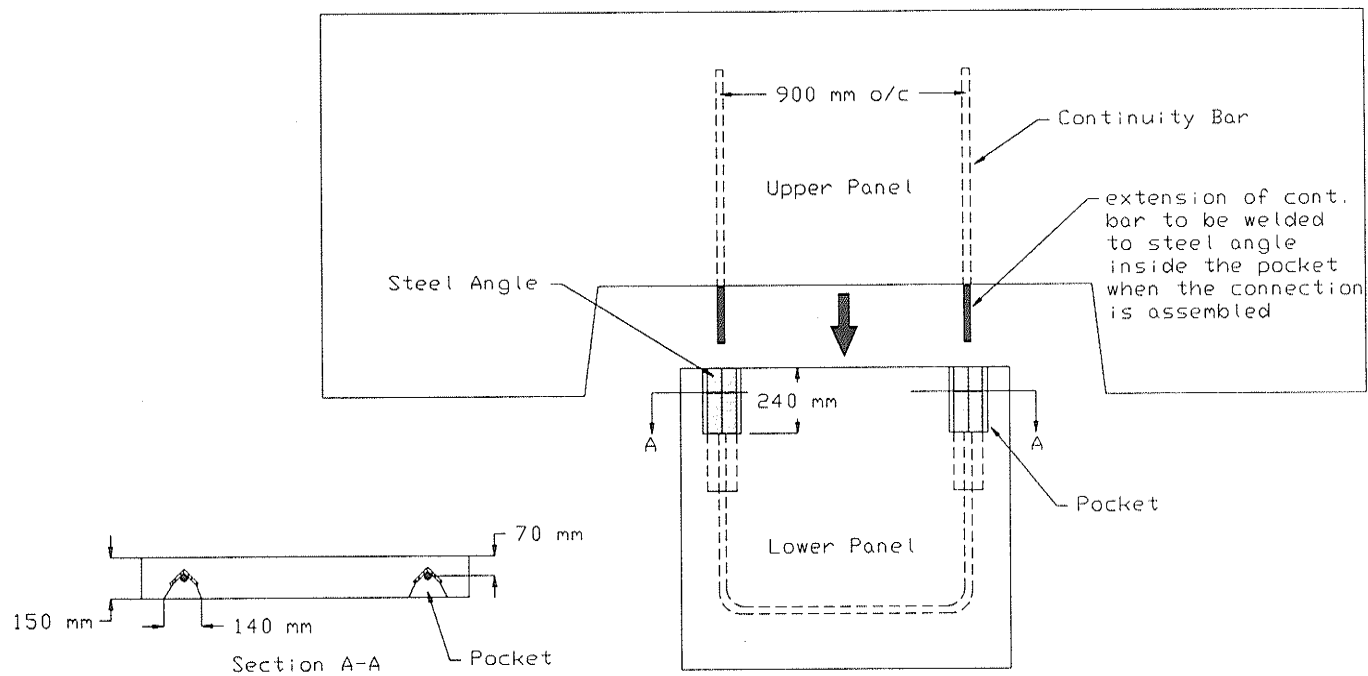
Specimen RW Configuration and Connection Assembly Details
